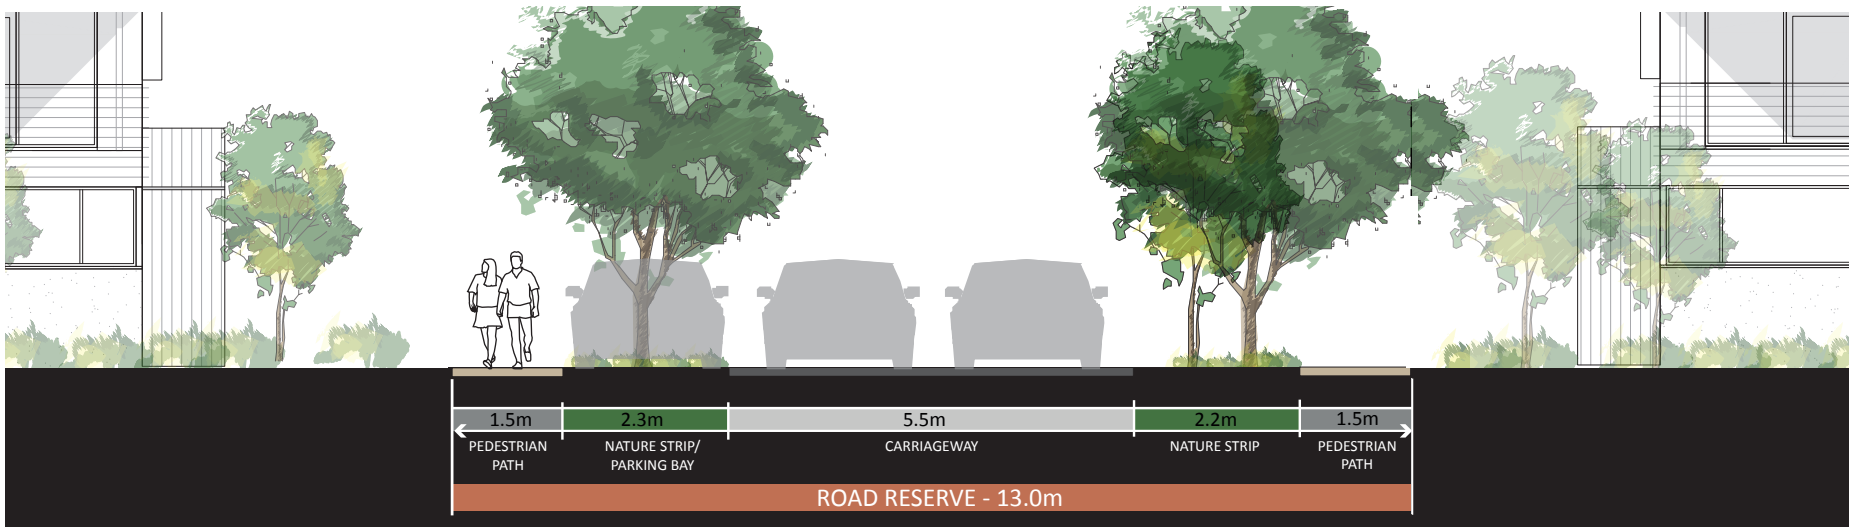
Cross Section - 13 metre wide road reserve - Secondary and Ancillary Internal Roads
